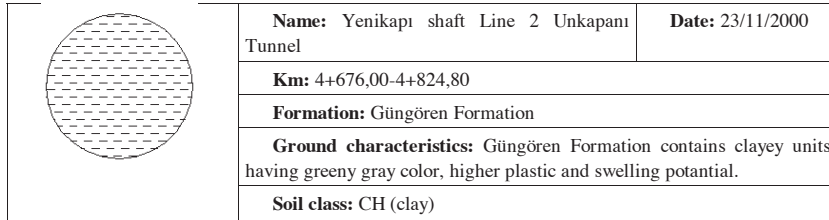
The face observation results on 4+676,00-4+824,80. km of YH₂U (yenikapı line 2 unkapanı) tunnel section.
